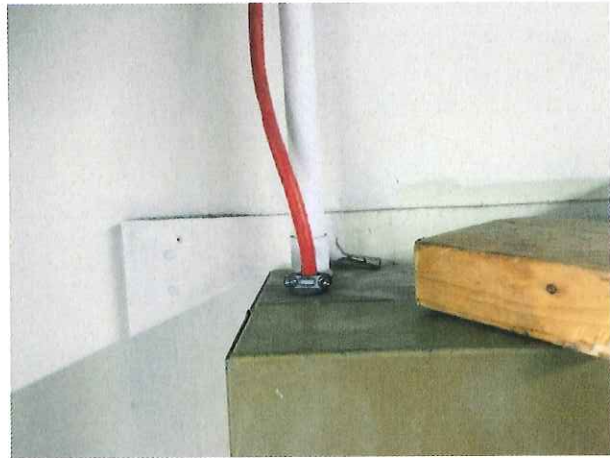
& 26: Junction Box with Emergency Feeder Taps; "Extension cord" control wiring.
